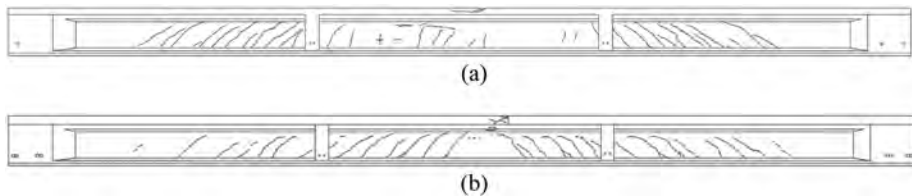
Crack pattern after the load tests: (a) B7-P47/46 (4-P bending test), and (b) B8-P47/46 (3-P bending test) girder.
